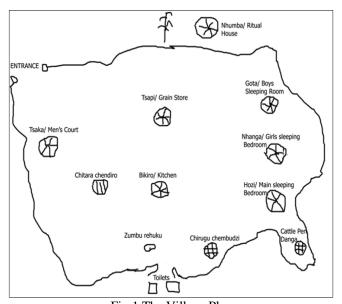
The Village Plan Source: Chipashu and Bvocho (2018)
